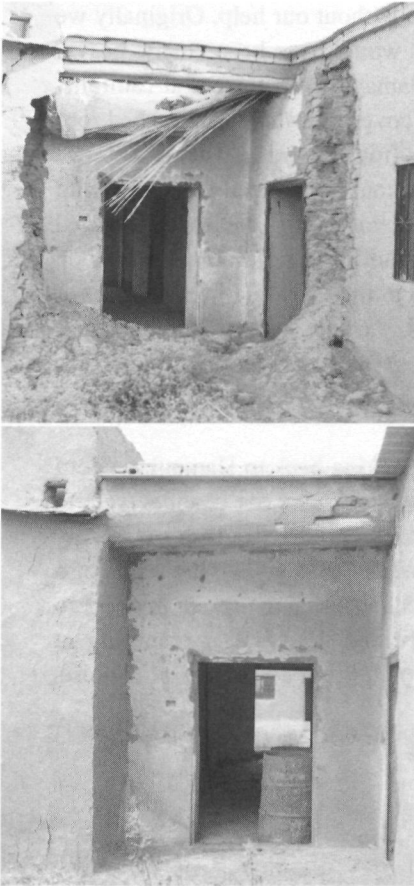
REFURBISH AND RESTORE: *Passageway between inner and outer courtyard of the dig house, bathrooms on the right side, entrance to dining room area visible in passage way; (above) water damage to roof and partial wall collapse (October 2004), (below) same area following basic repair to walls and roof, before replastering of alcove (April 2005)
